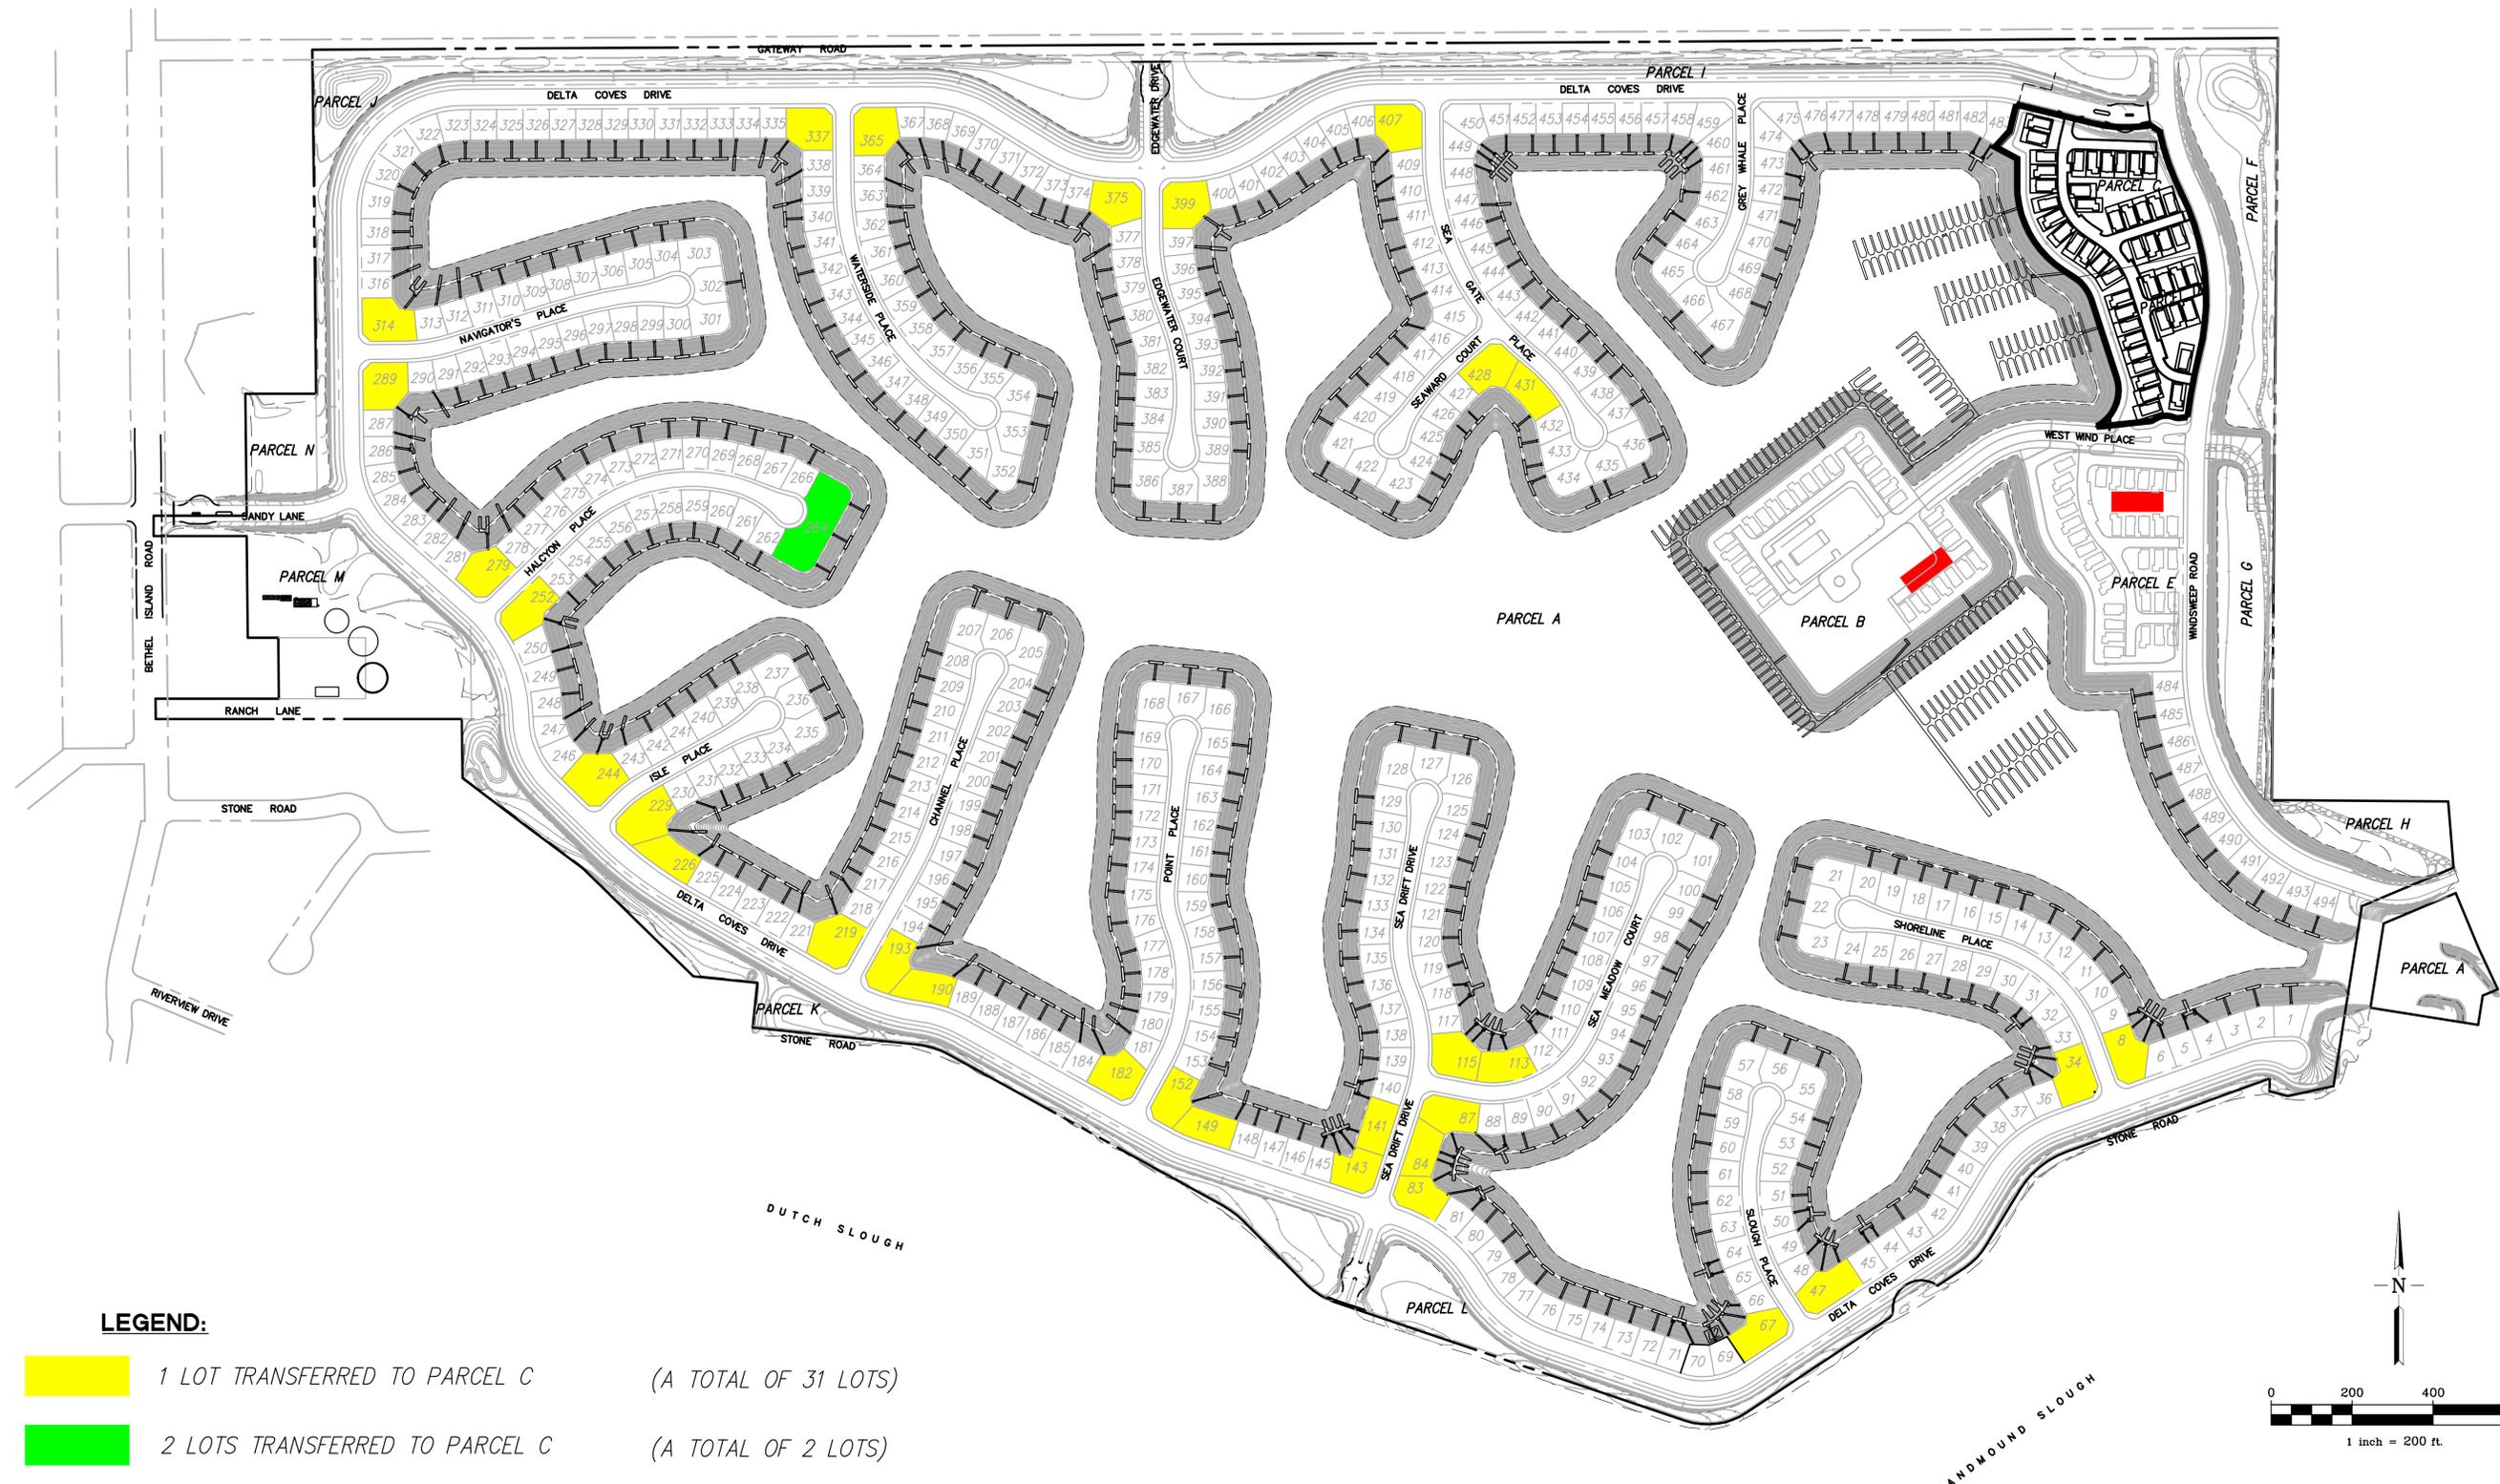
## EXHIBIT A - REQUESTED GENERAL PLAN USES AND FUTURE SITE USES
